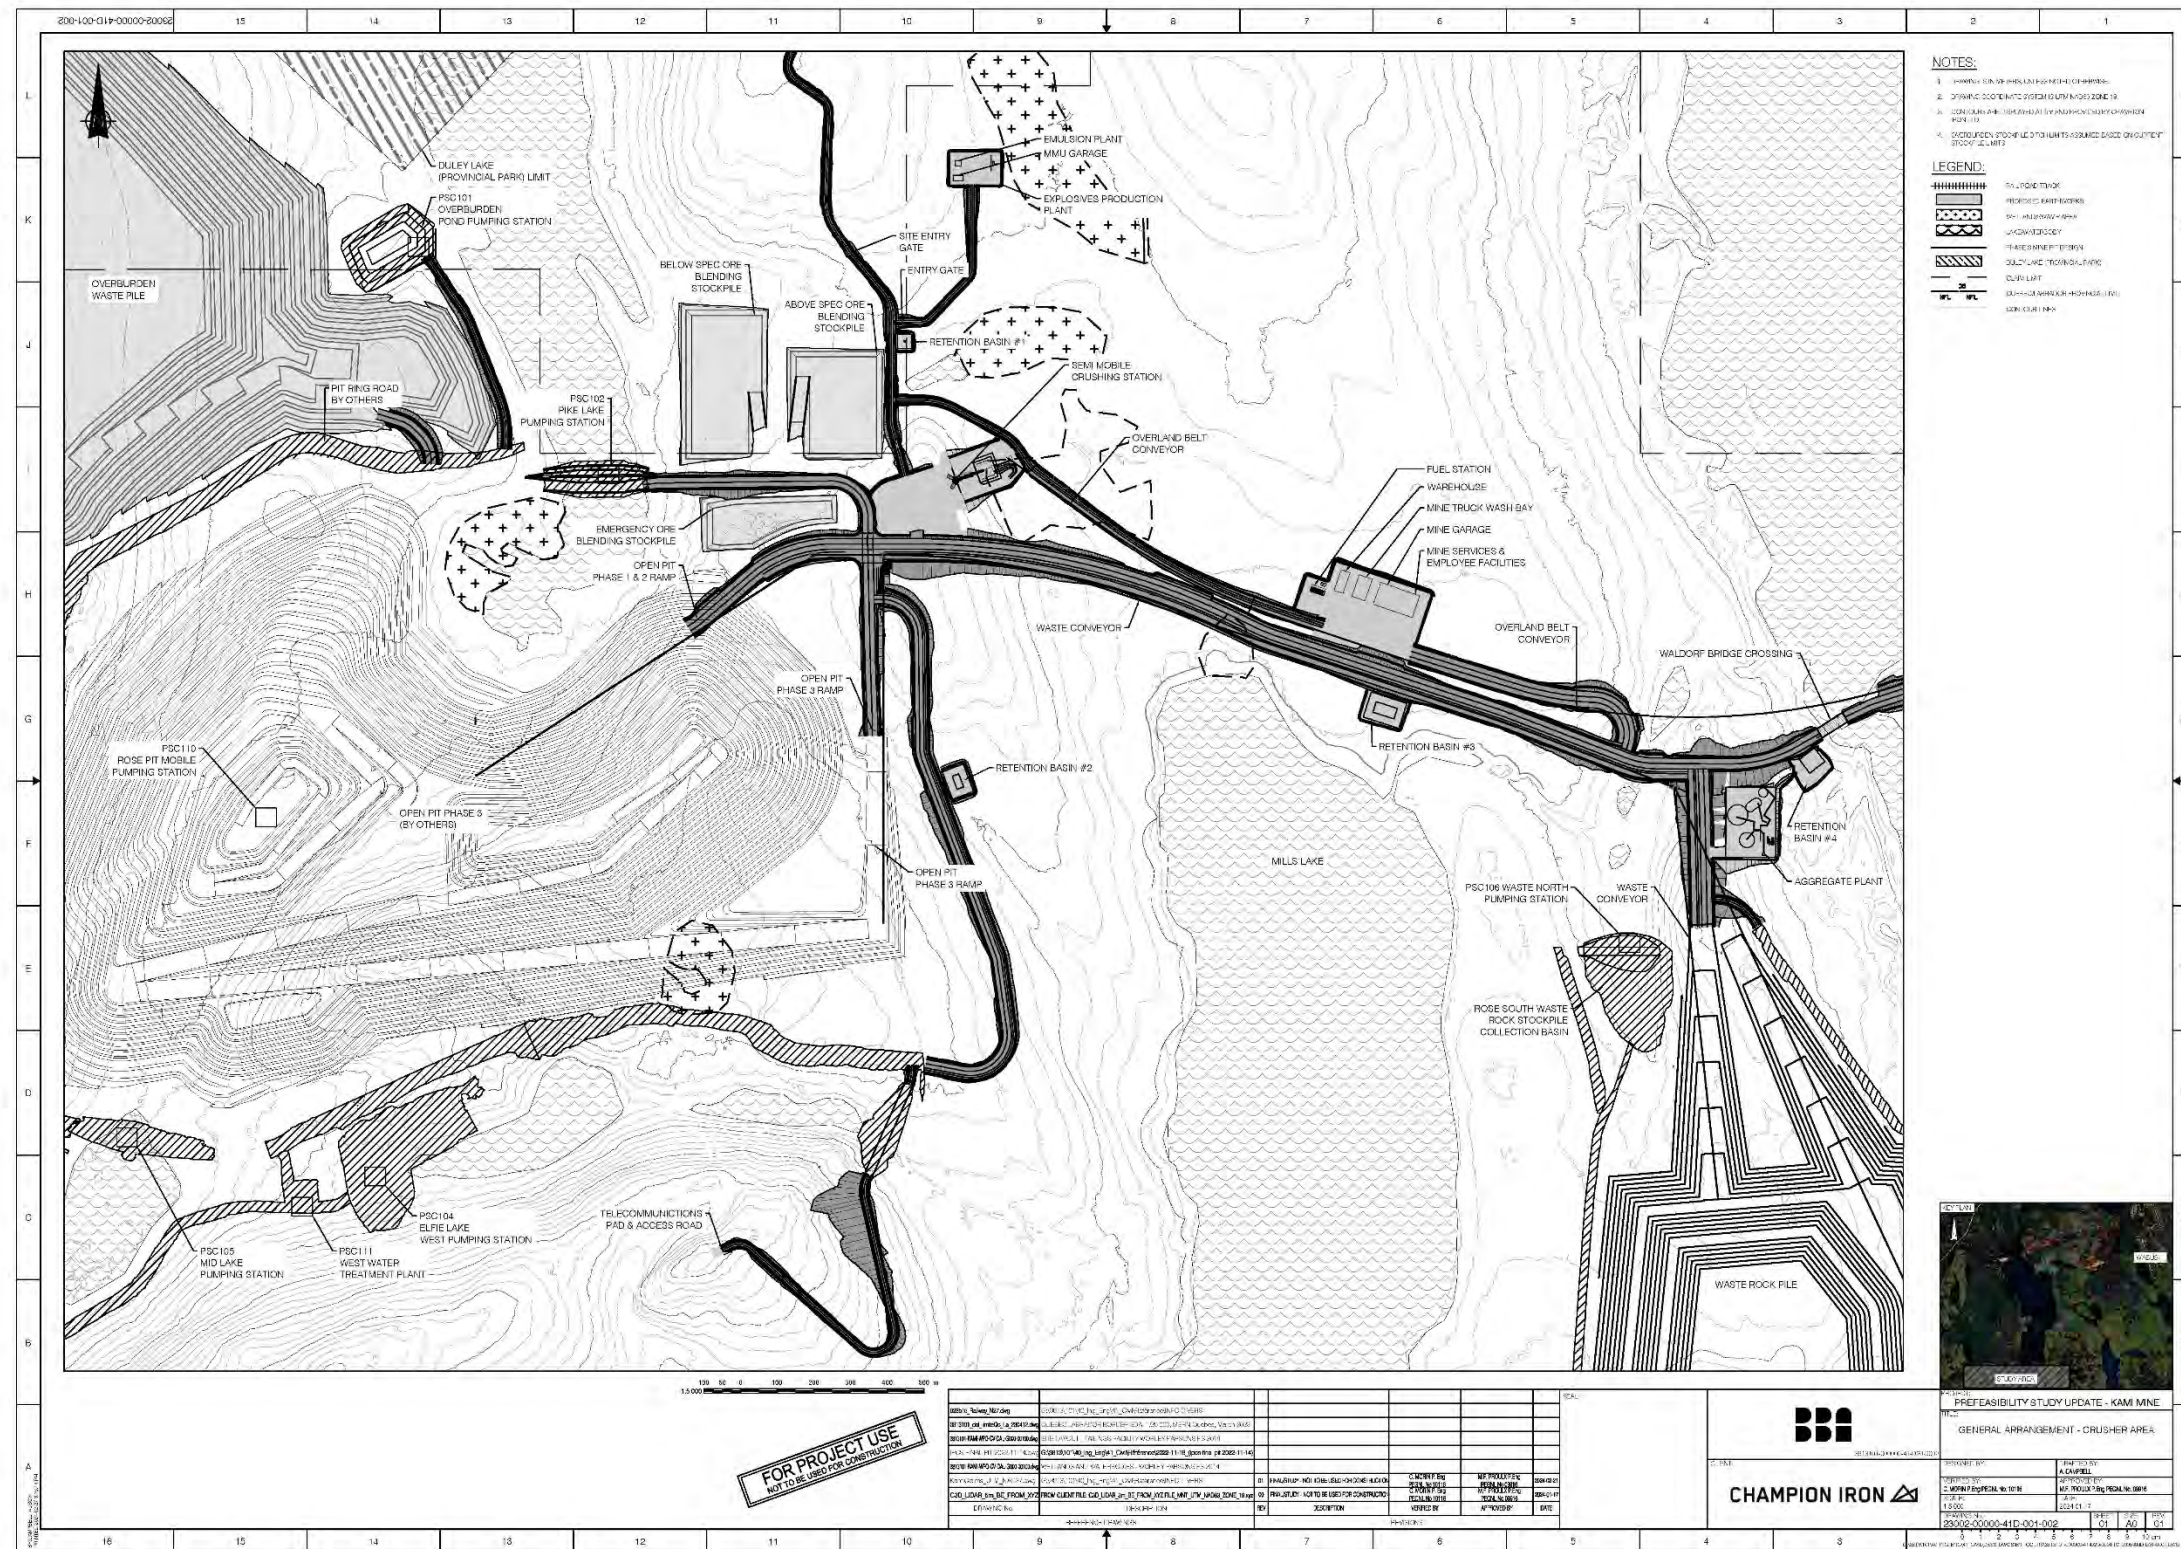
Site Plan Kami Iron Ore Project (Zoom on Kami Site Infrastructure- West)
